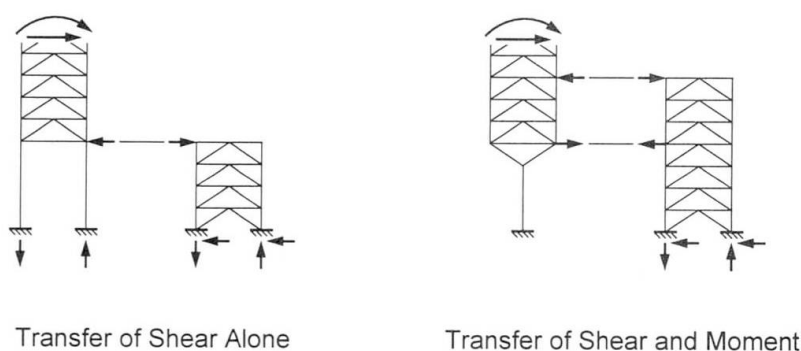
Structural transfer concepts for horizontal shear and overturning moment
